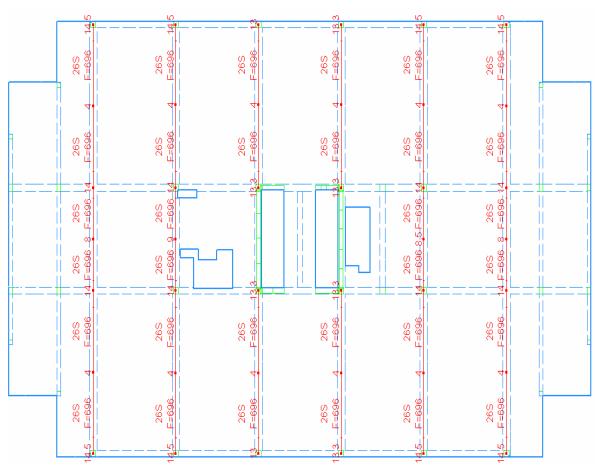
Longitudinal tendon plan view with tendon forces labeled
